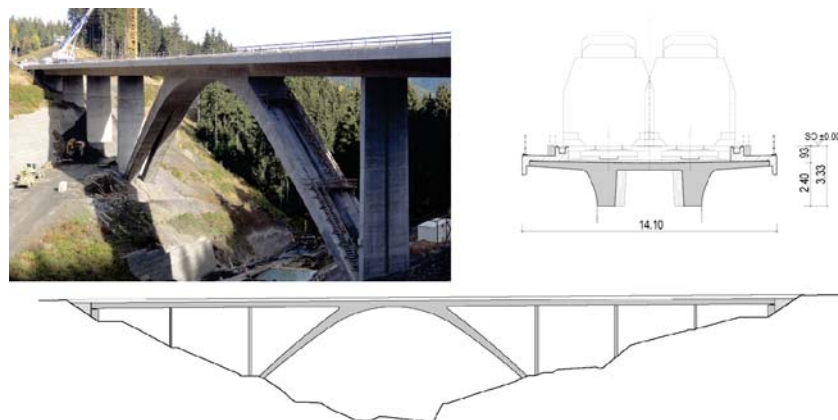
Completed Grubental Bridge; cross-section and elevation drawings.
